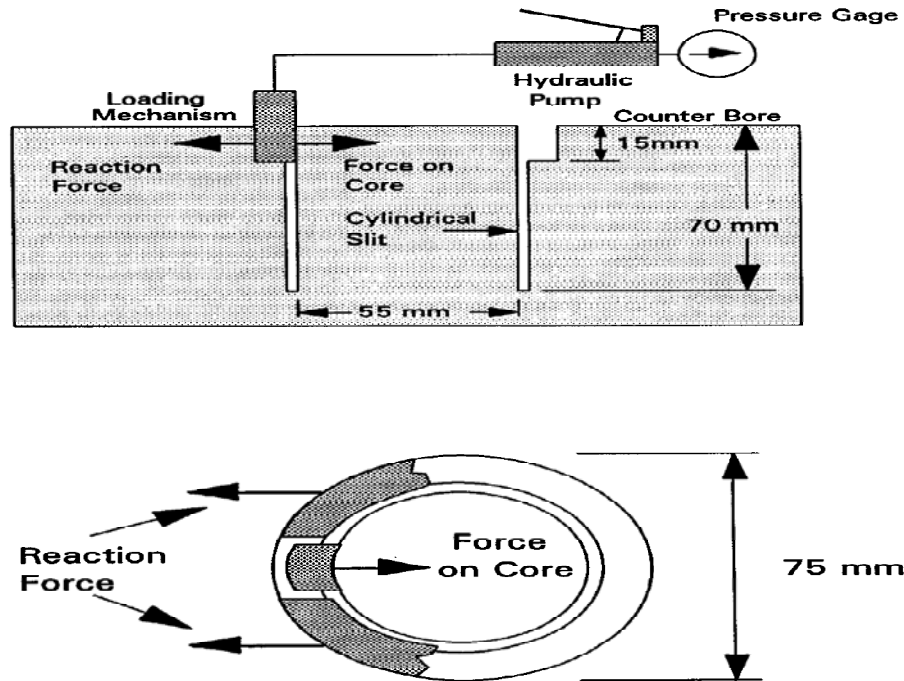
schematic of cylindrical slit and application of load for Break-Off test
